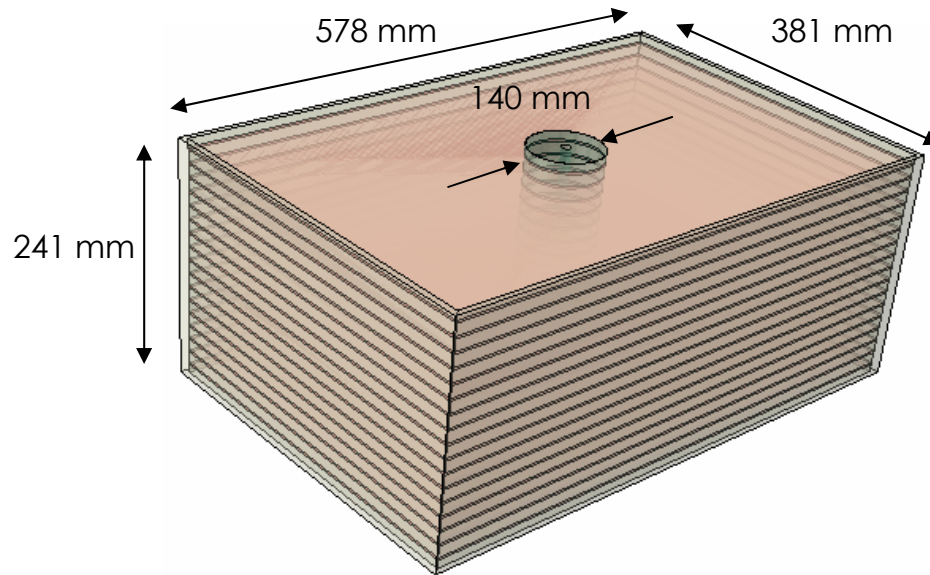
Schematic of the test bearing used in Experiment-2.
